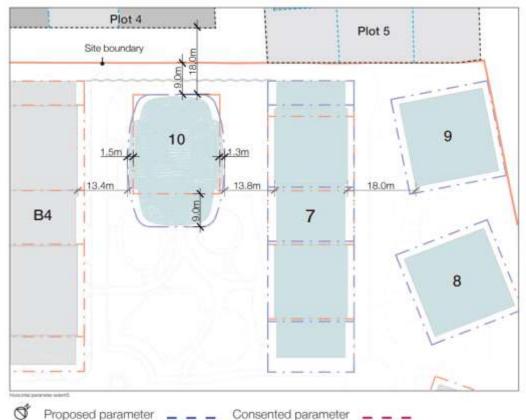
This image identifies the additional width and depth of Building 10 alongside the separation distances between buildings.
